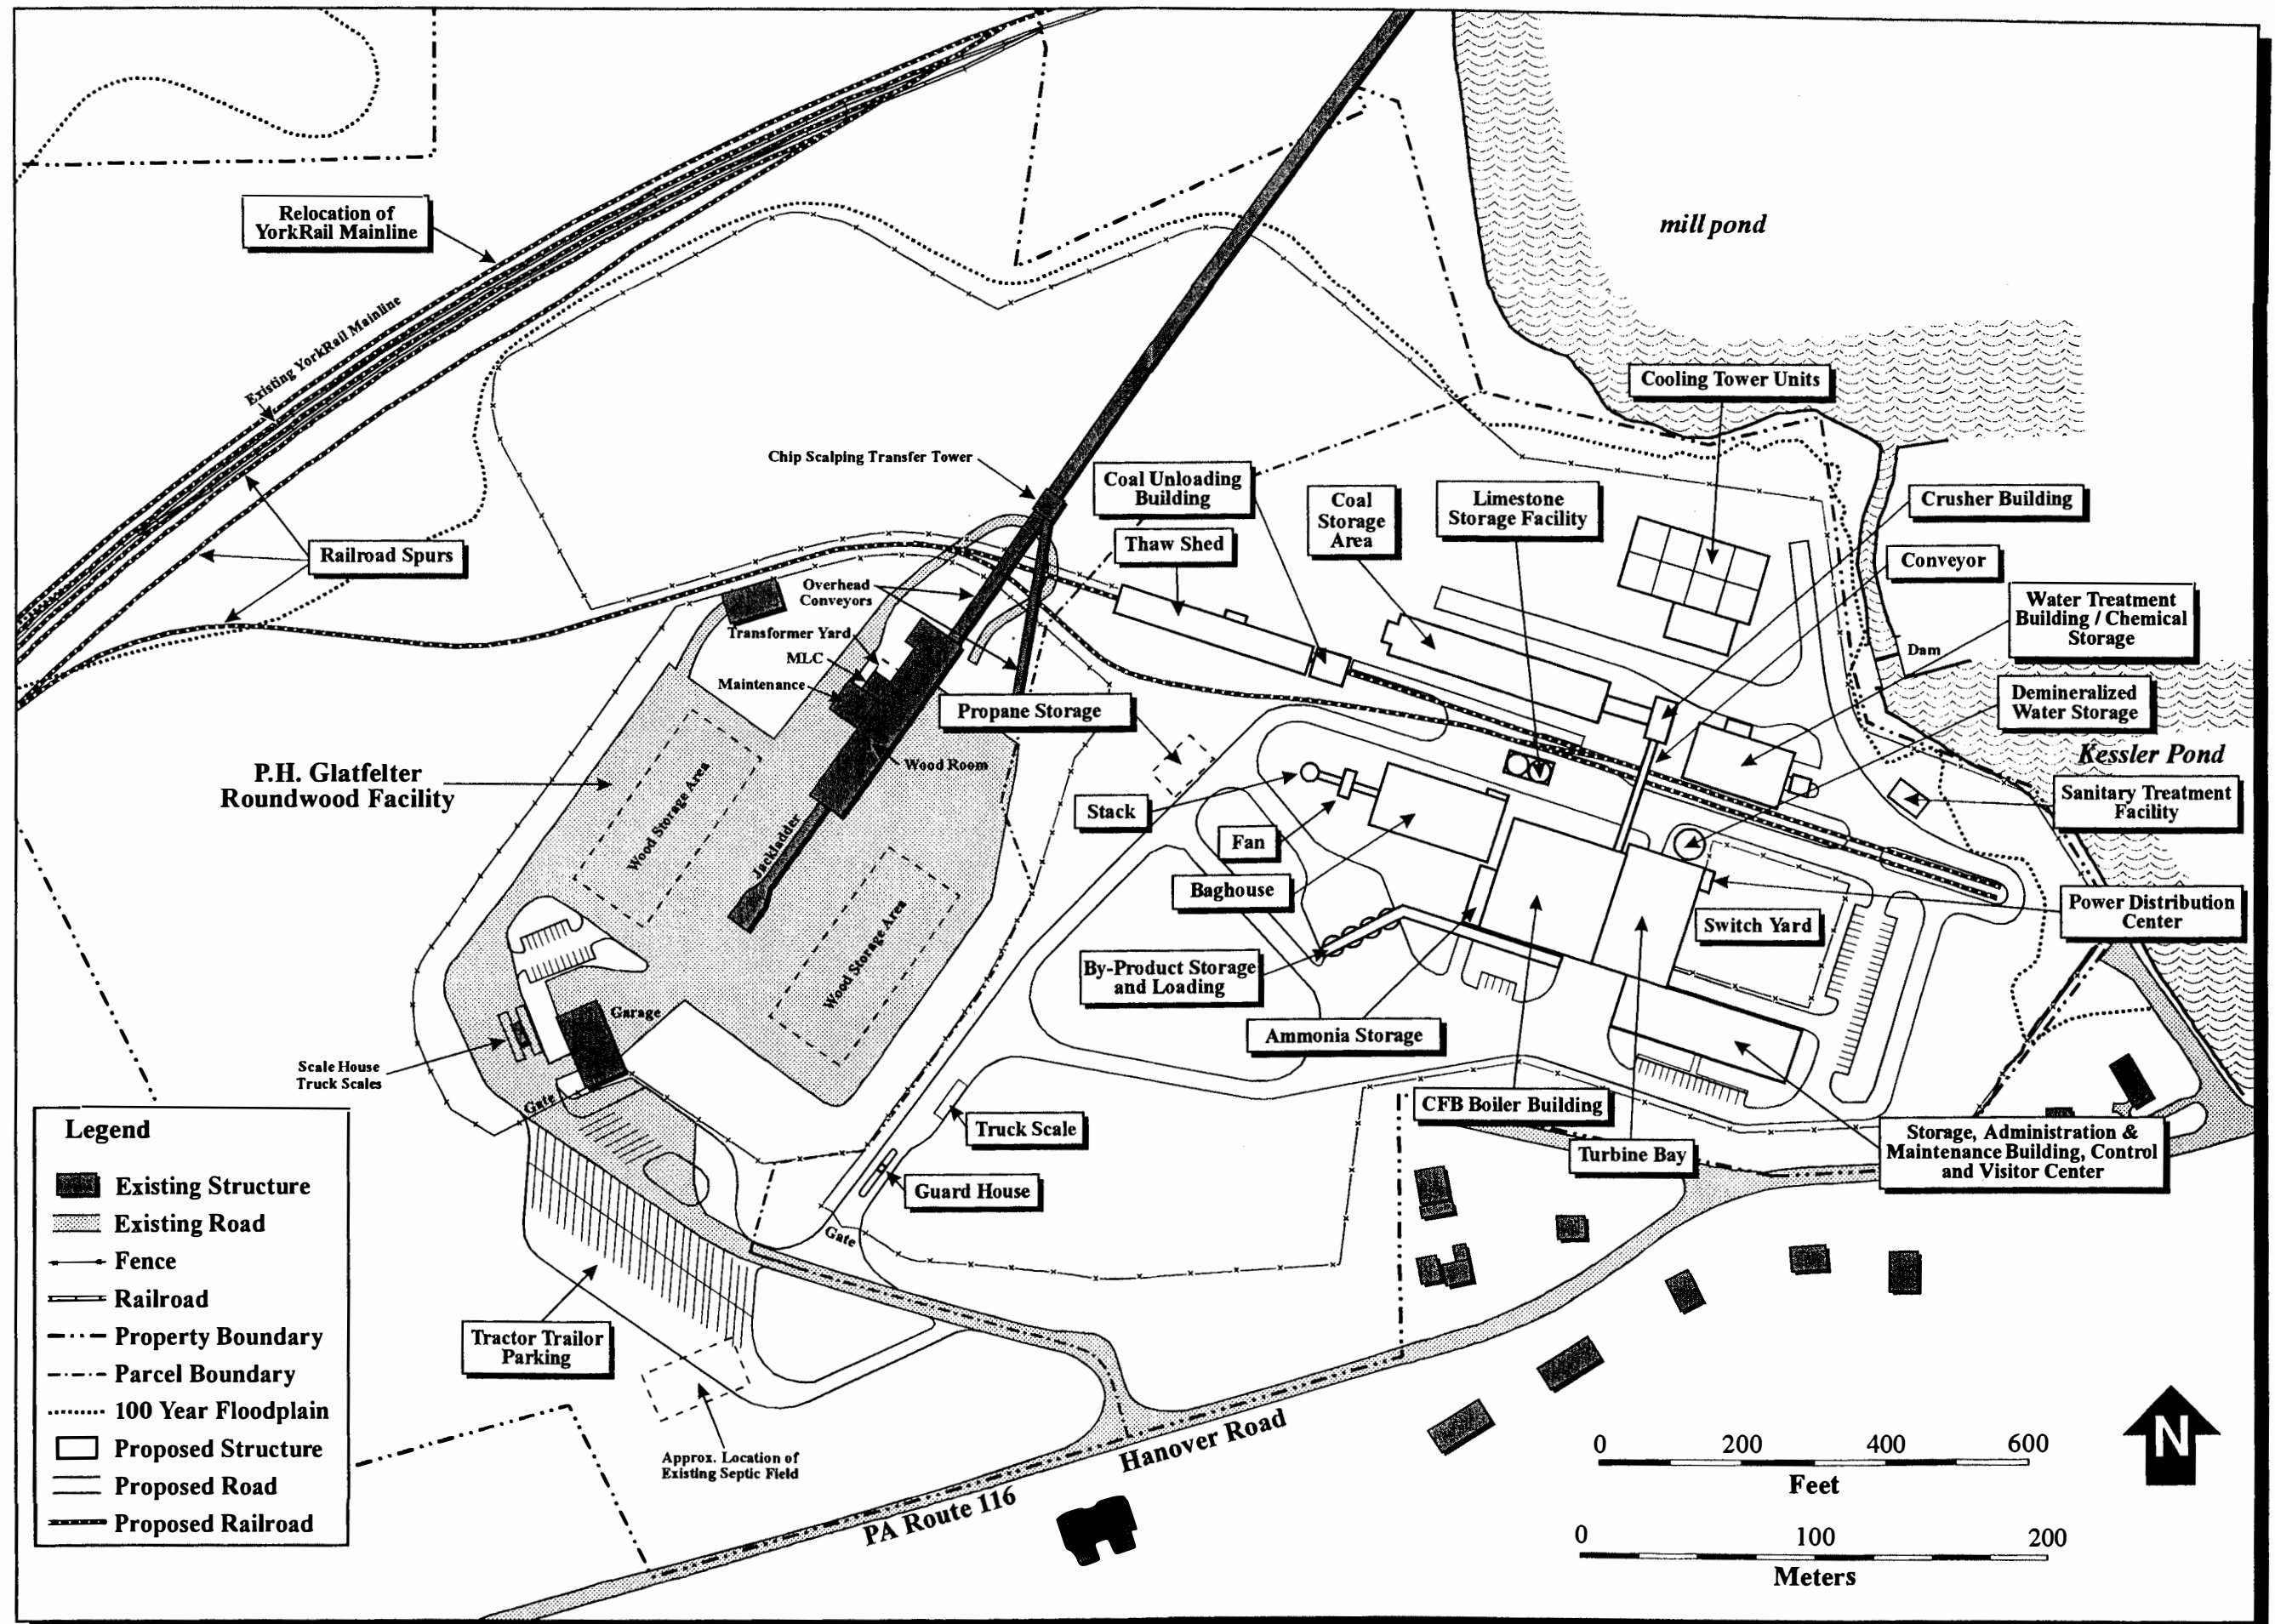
Proposed YCEP cogeneration facility site plan for the North Codorus Township site.
